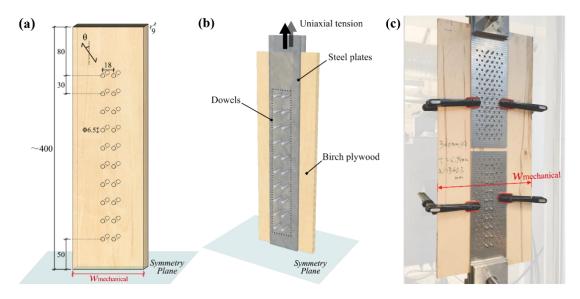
a) Detailed specimen dimensions, b) apparatus setup, and c) test picture of birch plywood specimens with mechanical connectors (unit: mm).
